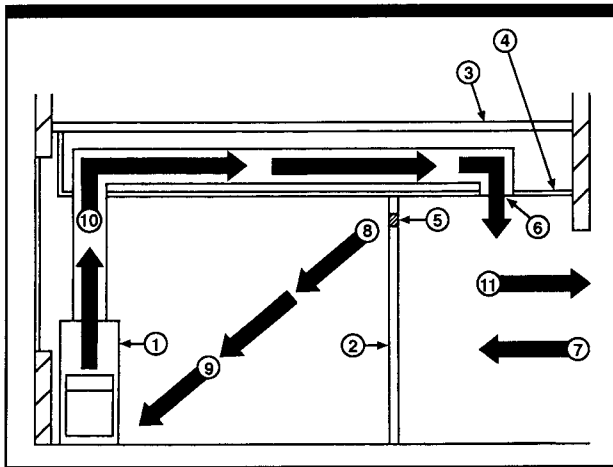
The ventilation-filtration unit in an isolation room (side view): 1) ventilation-filtration unit; 2) interior partition; 3) existing ceiling; 4) suspended, gasketed tile ceiling; 5) adjustable vane, dampered louver; 6) ceiling air diffuser or grille; 7) outside air from corridor; 8) filtered and fresh air entering isolation room near ceiling; 9) air being pulled toward floor by ventilation-filtration unit; 10) filtered air being ducted back to the anteroom; 11) filtered air returning to corridor.
